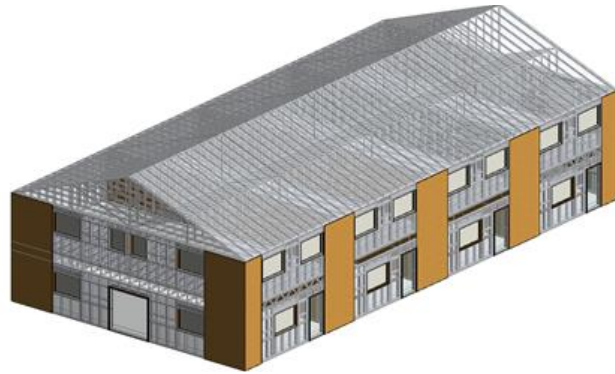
Isometric view of the 2-story high seismic MFD wood light-frame building archetype.
